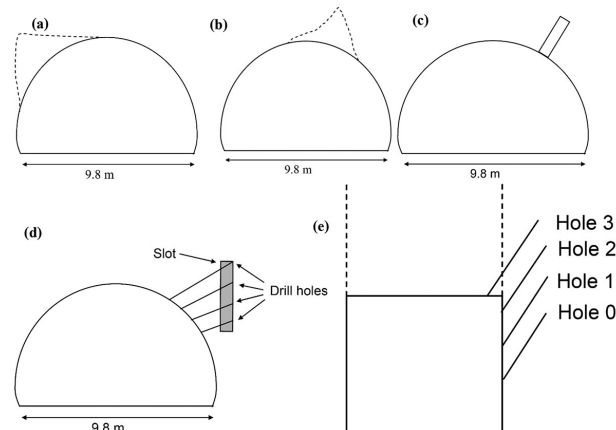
Destress blasting modelling and practical trials at Malmerget mine: (a) sloping roof profile sketch, (b) roof churching sketch (c) sketch of modelled mining drift and 2.7 m high slot, (d) adopted destress blasting layout for mine trials (section view), (e) adopted destress blasting layout for mine trials (plan view). (Larsson (2004b) after Borg (1988))
